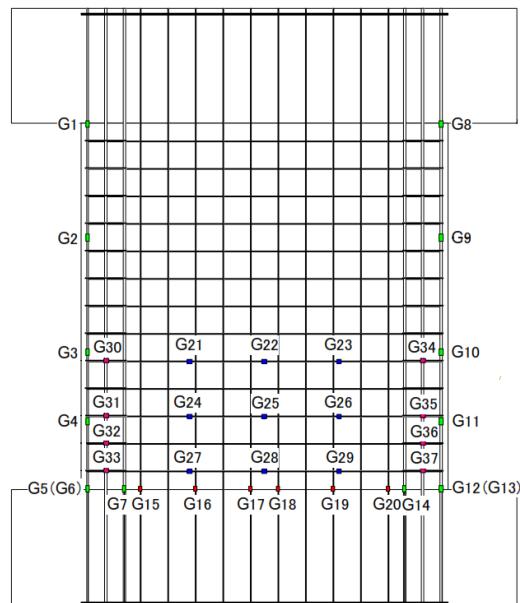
Strain gauges setup – Reinforcing steel bars
